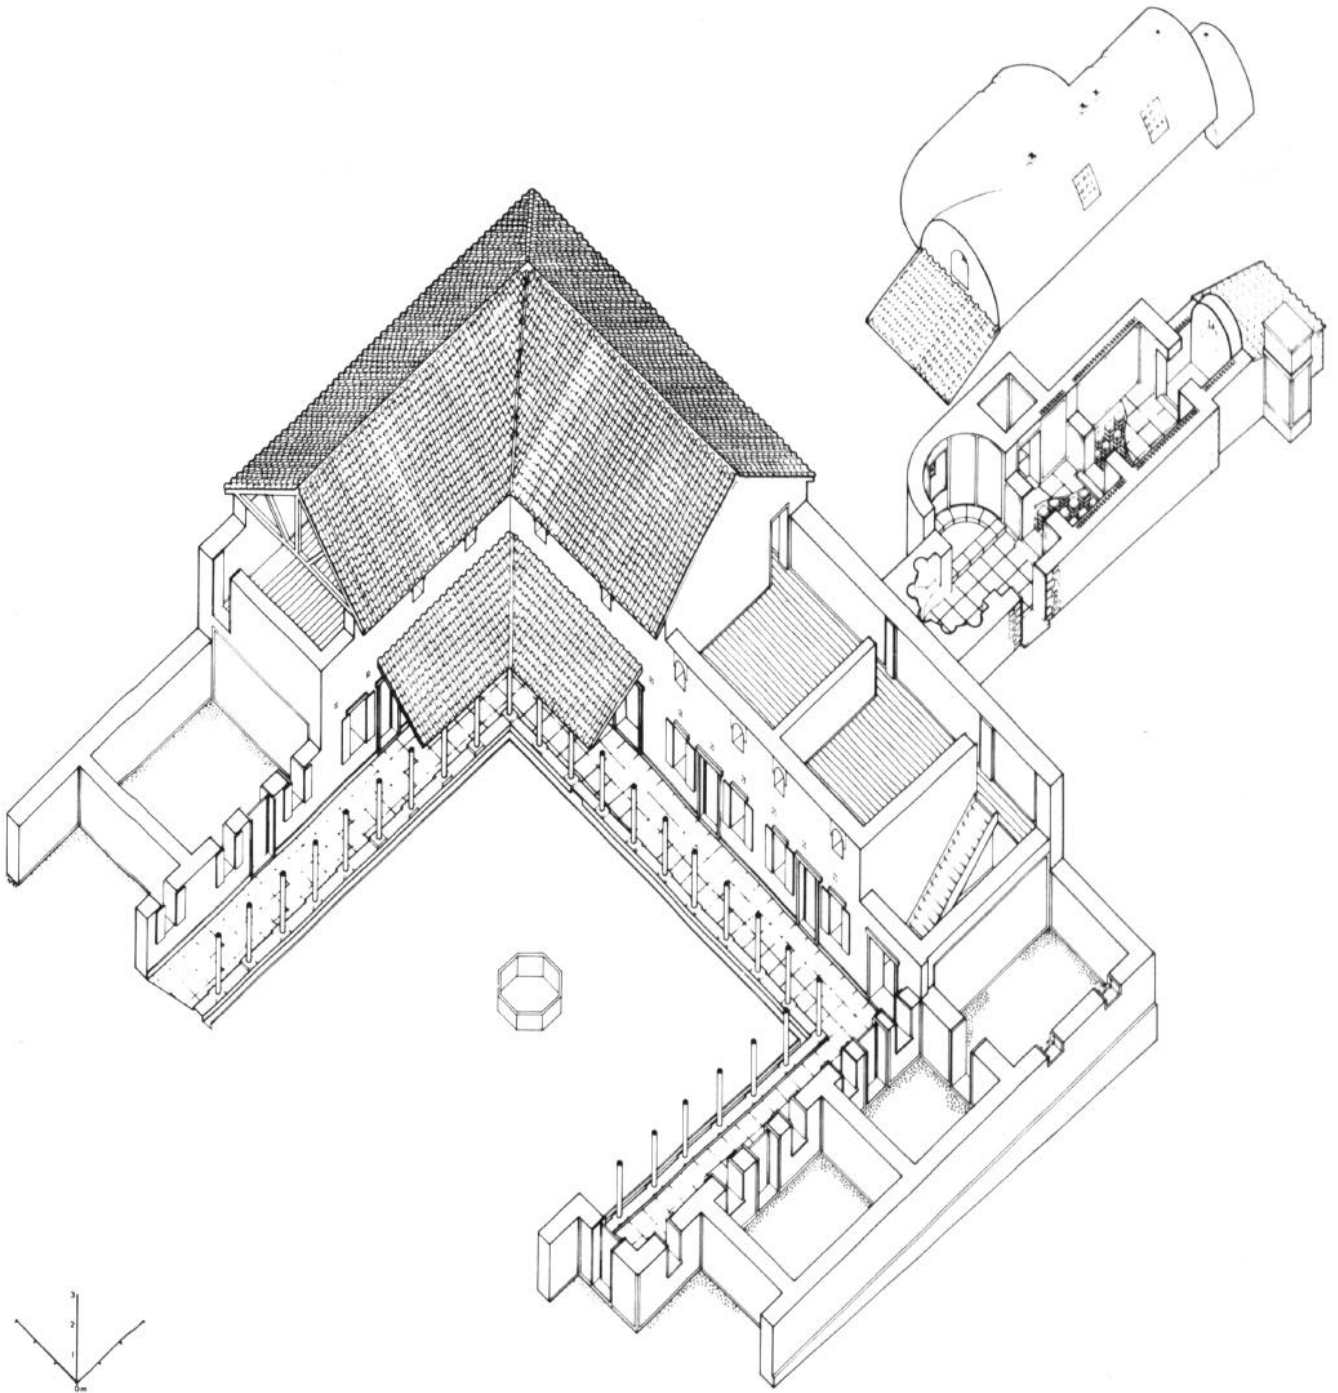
Reconstruction drawings of the courtyard building and bath-house.
